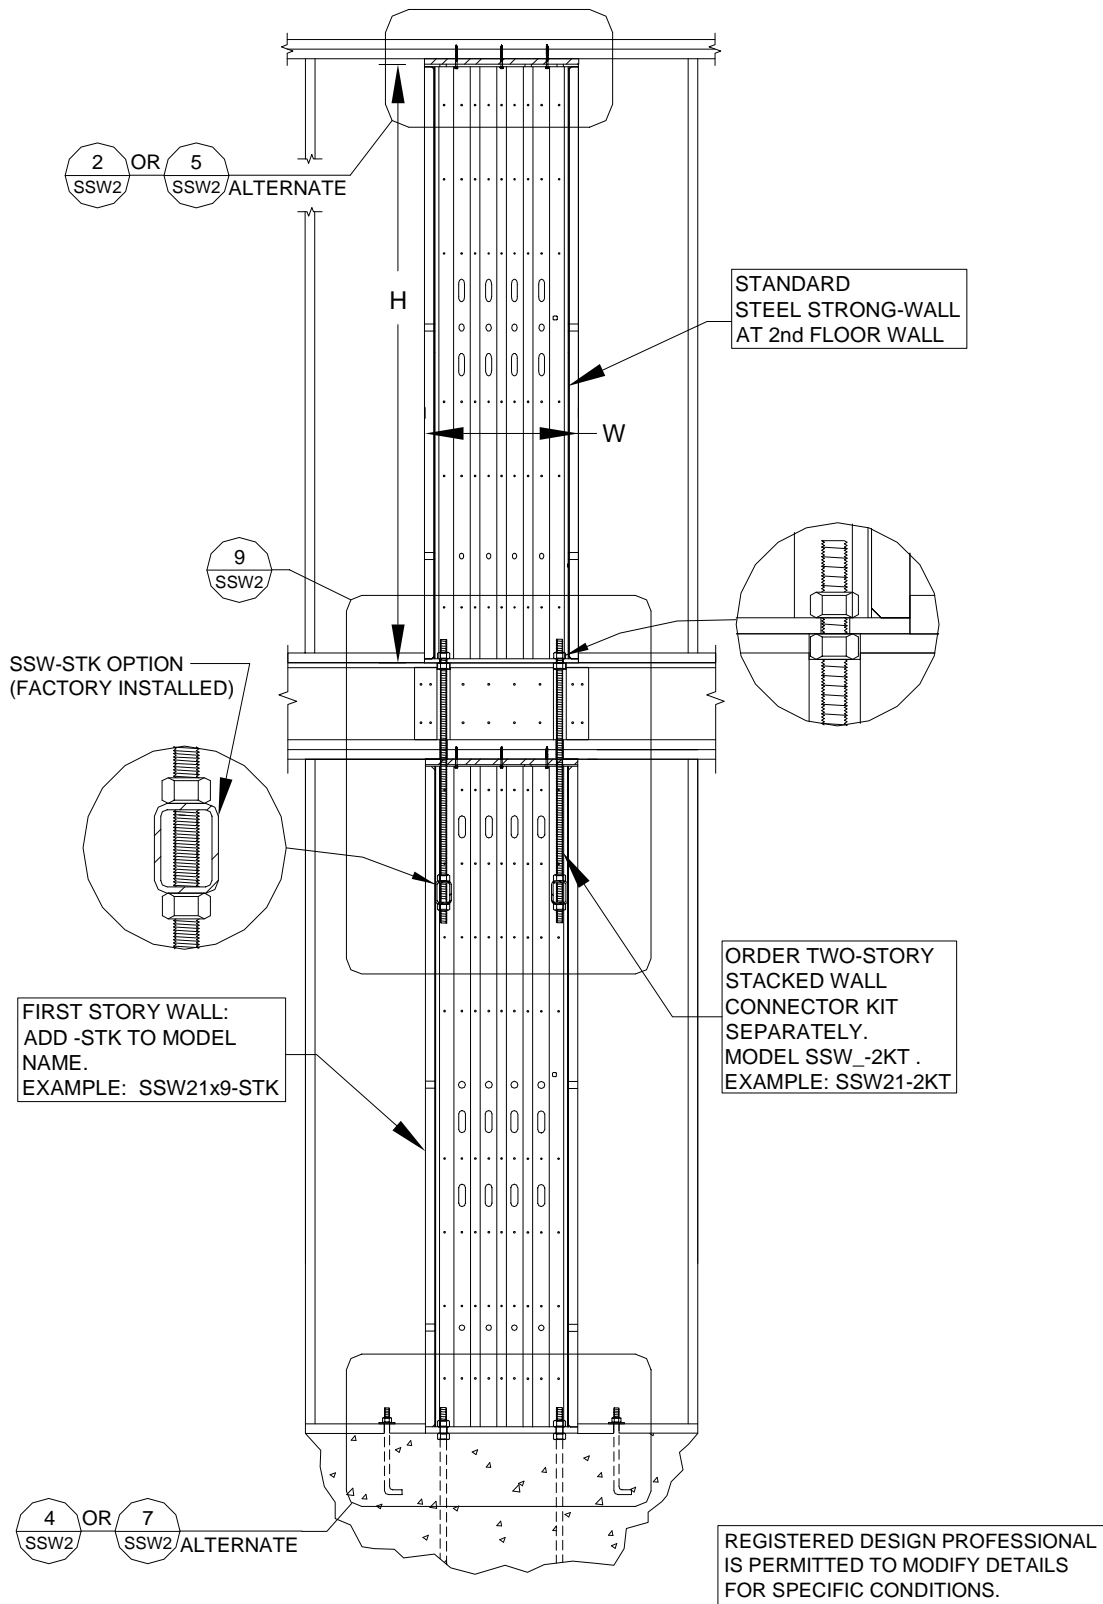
STEEL STRONG-WALL WOOD FLOOR DETAILS (10/SSW2)
